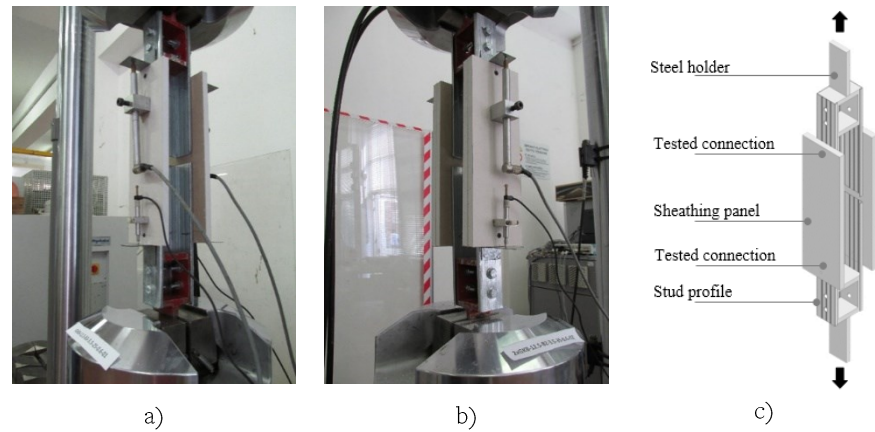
Tested panel-to-steel connection typologies: a) single panel layer; b) double panel layer; c) typical assembly
